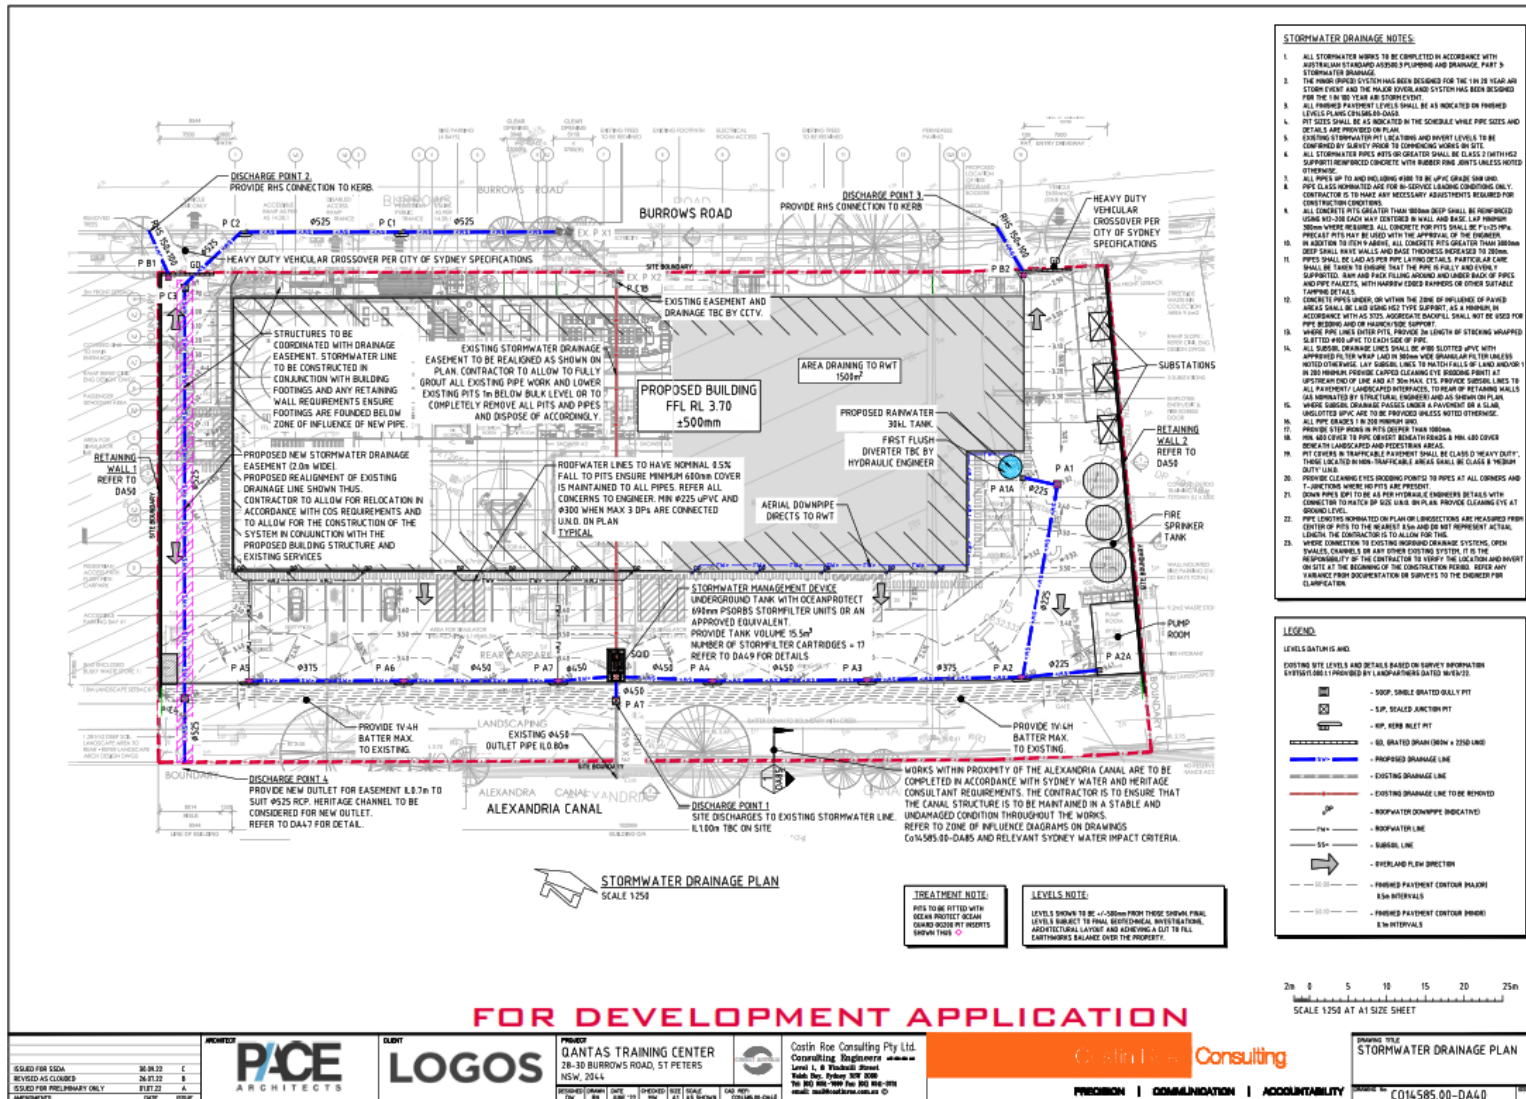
Stormwater Drainage Plan of Sydney Flight Training Facility 28-30 Burrows Road. (Source: CAE and LOGOS, 2022)
